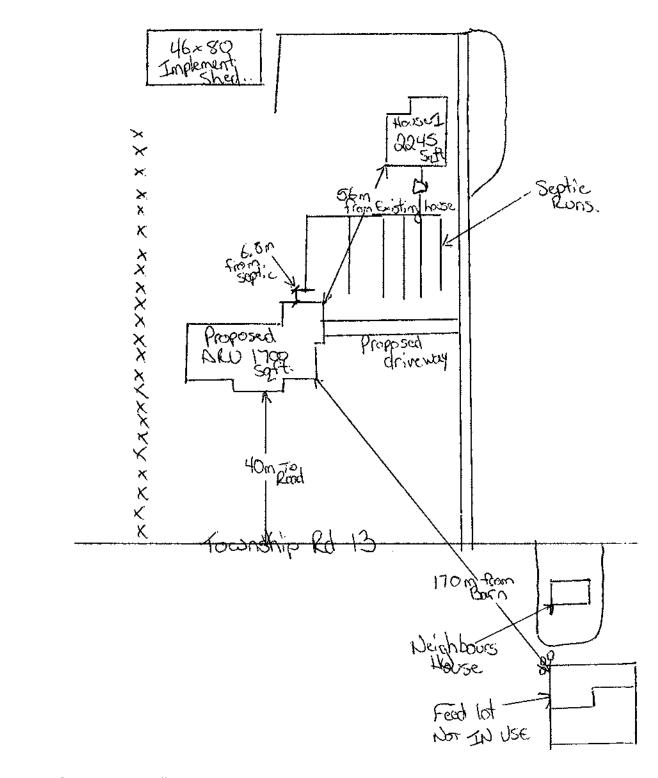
Applicants' Sketch - ARU #1 File No. ZN1-24-10 (Calhaven Farms) Part Lots 5-6, Concession 13 (Blandford), Township of Blandford-Blenheim, 926001 & 926037 Township Road 13 SCALE:
